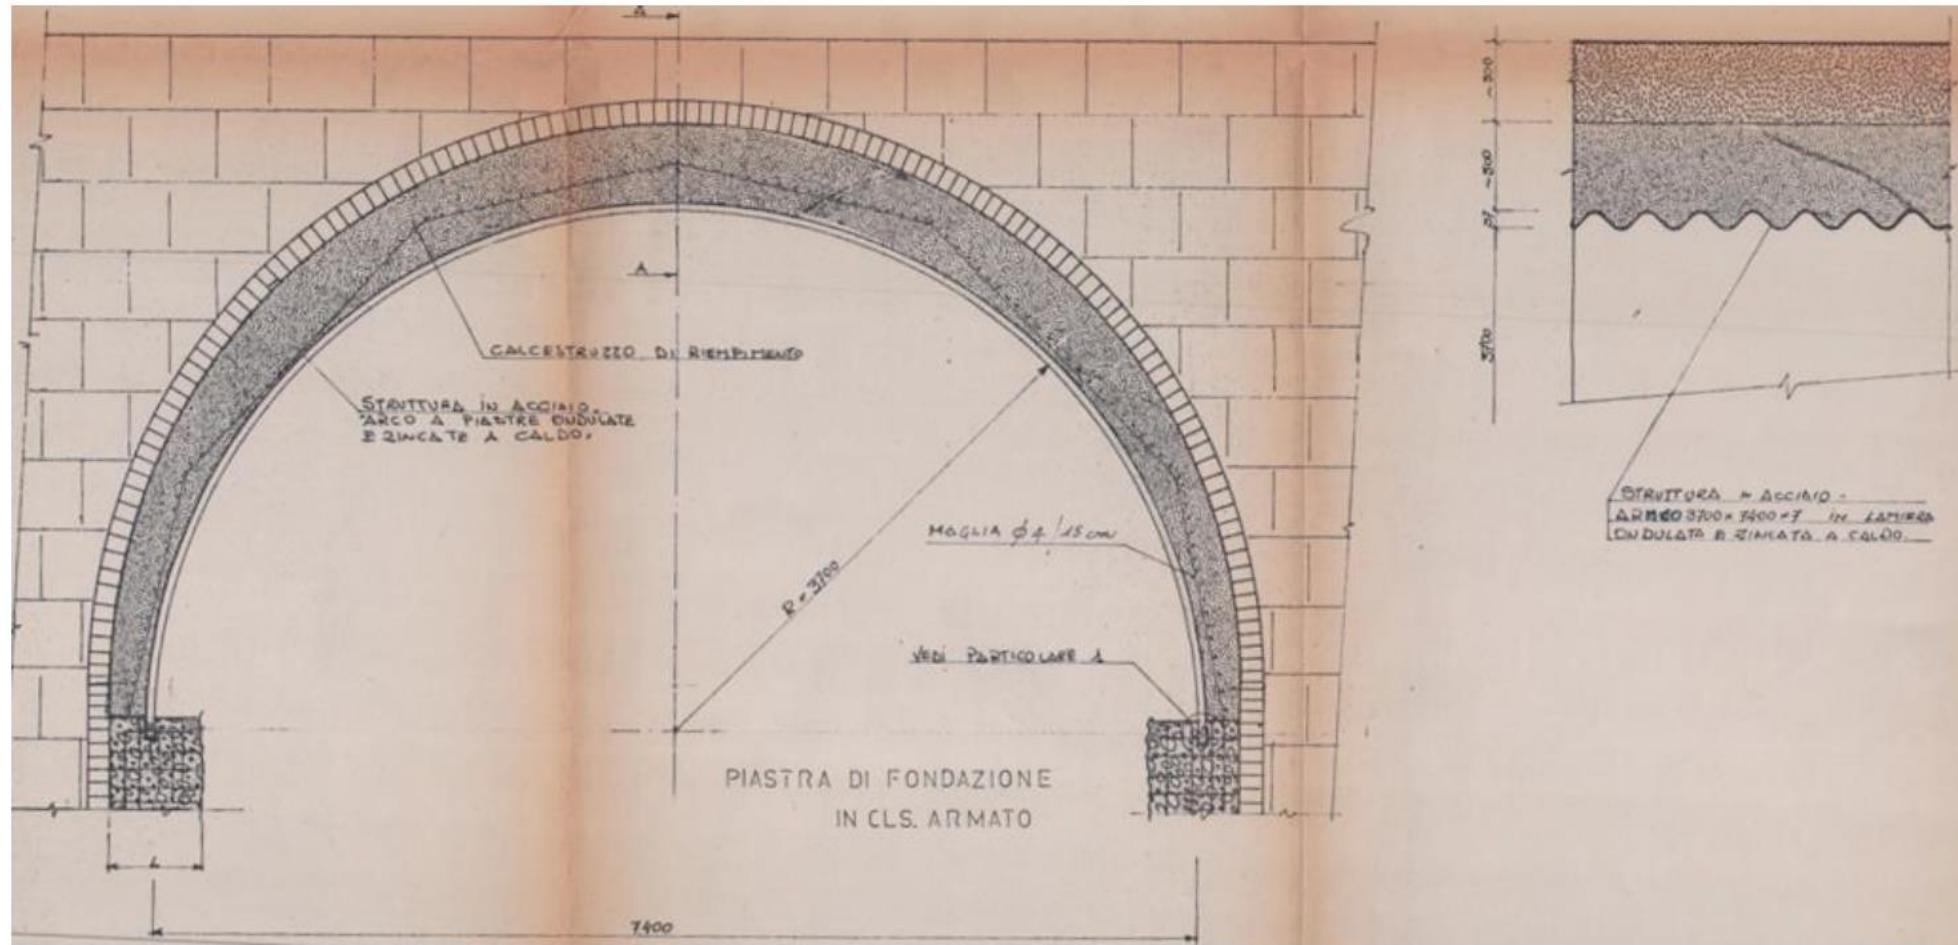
Railway Maletto masonry arch bridge (the original drawing of the retrofitting strategy)
